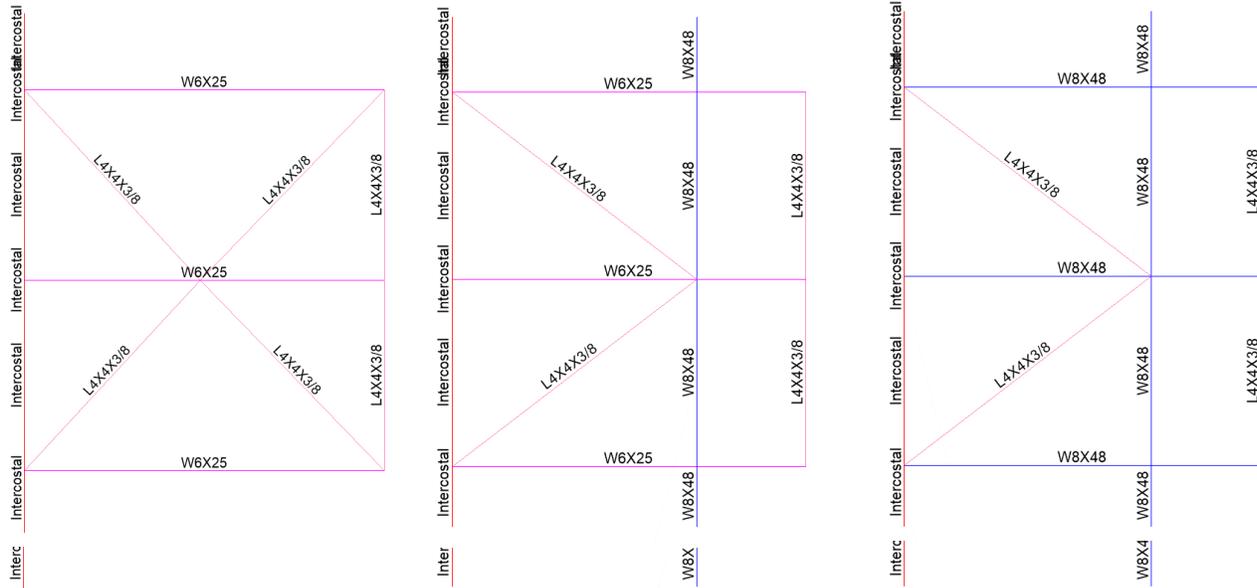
Cross-Sections of Bulkhead Framing
